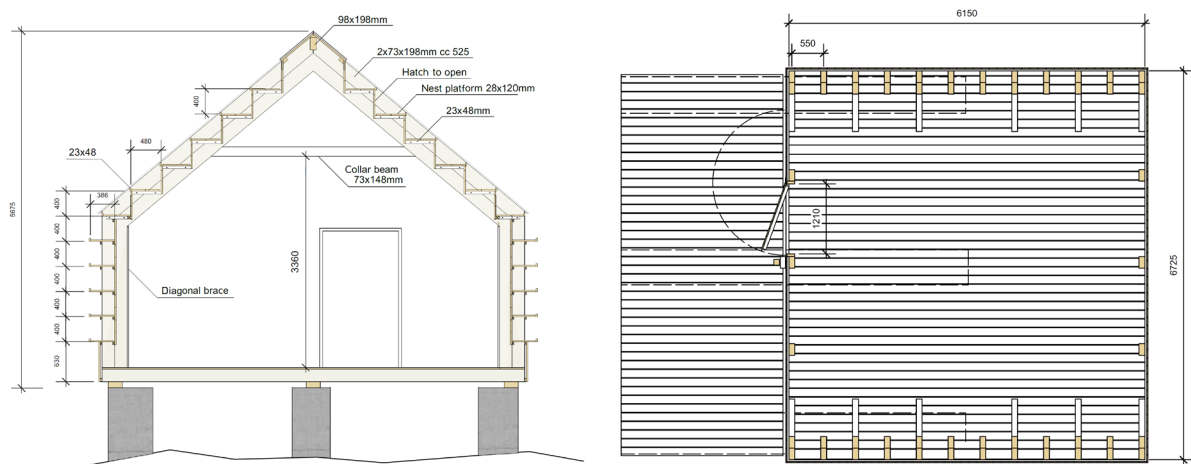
Construction details of the Kittiwake hotel in Røst: front-viewed cross section (left) and plan view (right). Dimensions of building materials are indicated. The final construction had 11 framework stands set 60 cm apart, rather than 12 stands set 55 cm apart. *Architectural drawings: Kjetil Sæterdal.
